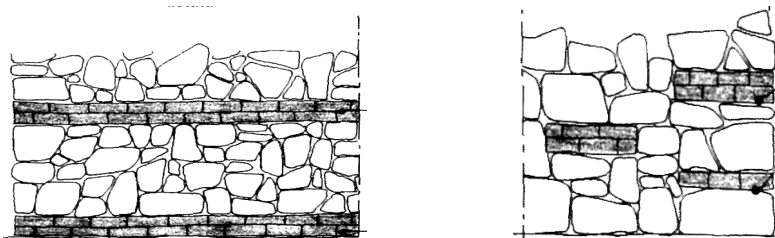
Two examples of masonry with a mix of stones and bricks. *a)* edged masonry; *b)* mixed masonry with bricks.
